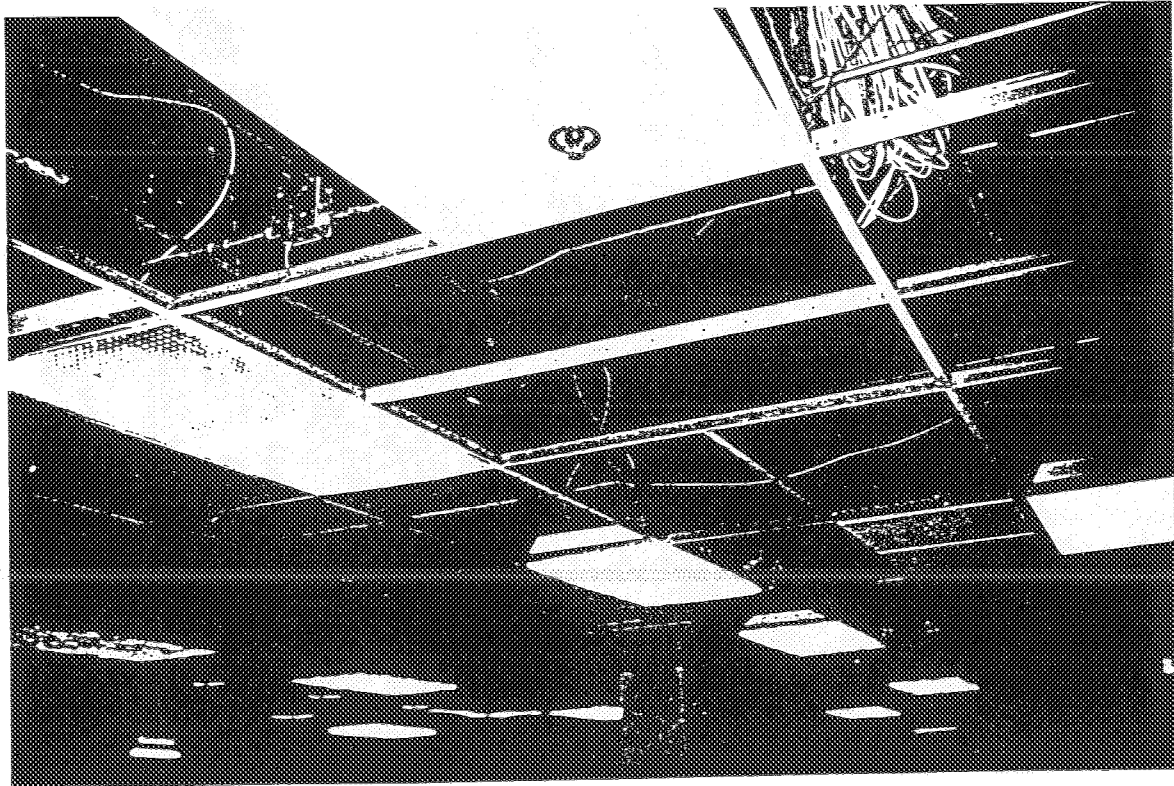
View looking up into drop ceiling showing ceiling tiles and no insulation.
